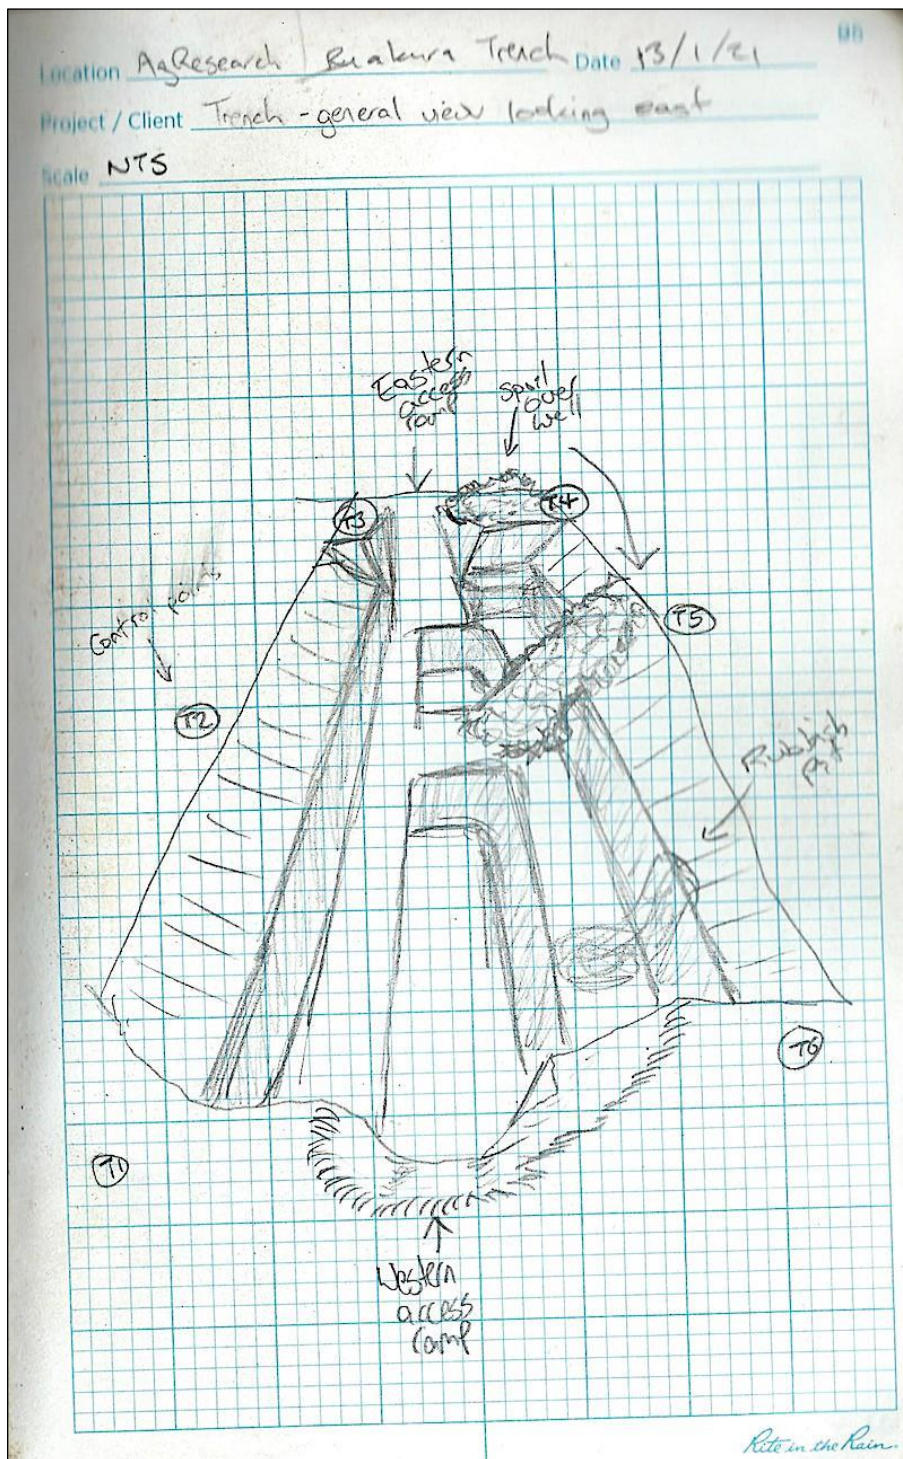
Sketch of the completed trench immediately after excavation, looking from W to E.
